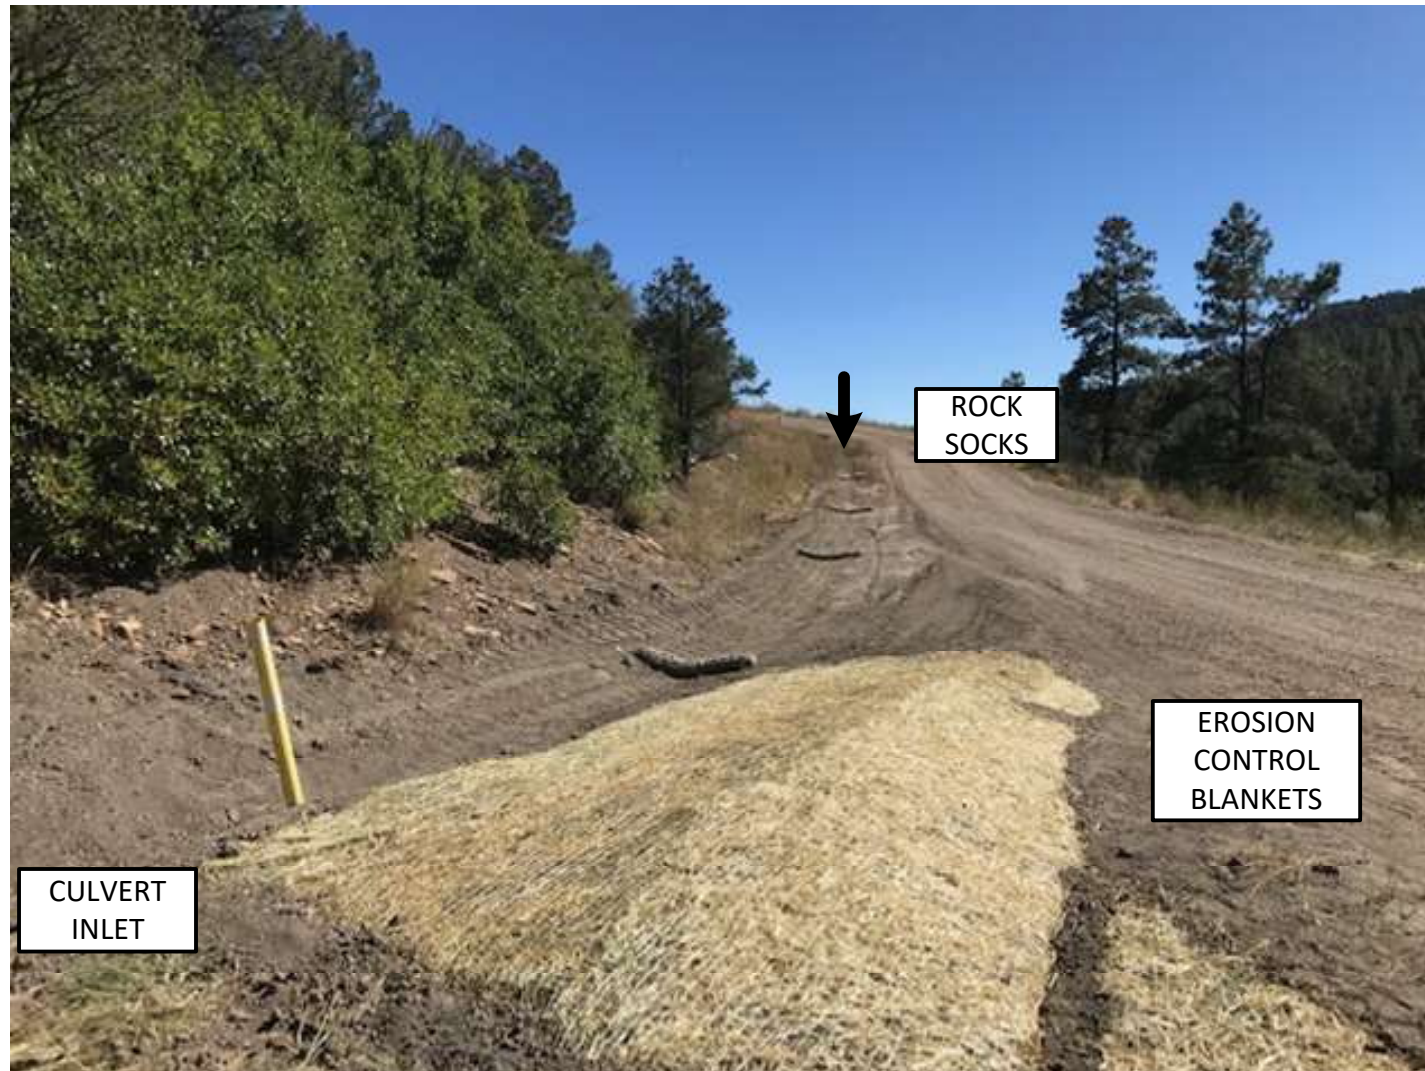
Run off to the culvert along the access road was not diverted to the culvert inlet. The bar ditch was dominated and erosion control blankets were installed where the ground was disturbed for soil stabilization. An approved CPW seed mix was hand broadcast to promote the establishment of vegetation. (4) rock socks were installed in the flow line to filter sediment until vegetation becomes established.
